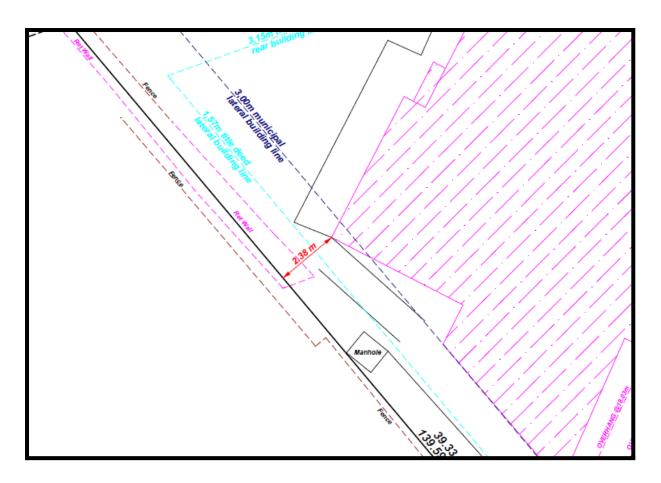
WESTERN LATERAL BUILDING LINE ENCROACHMENT
